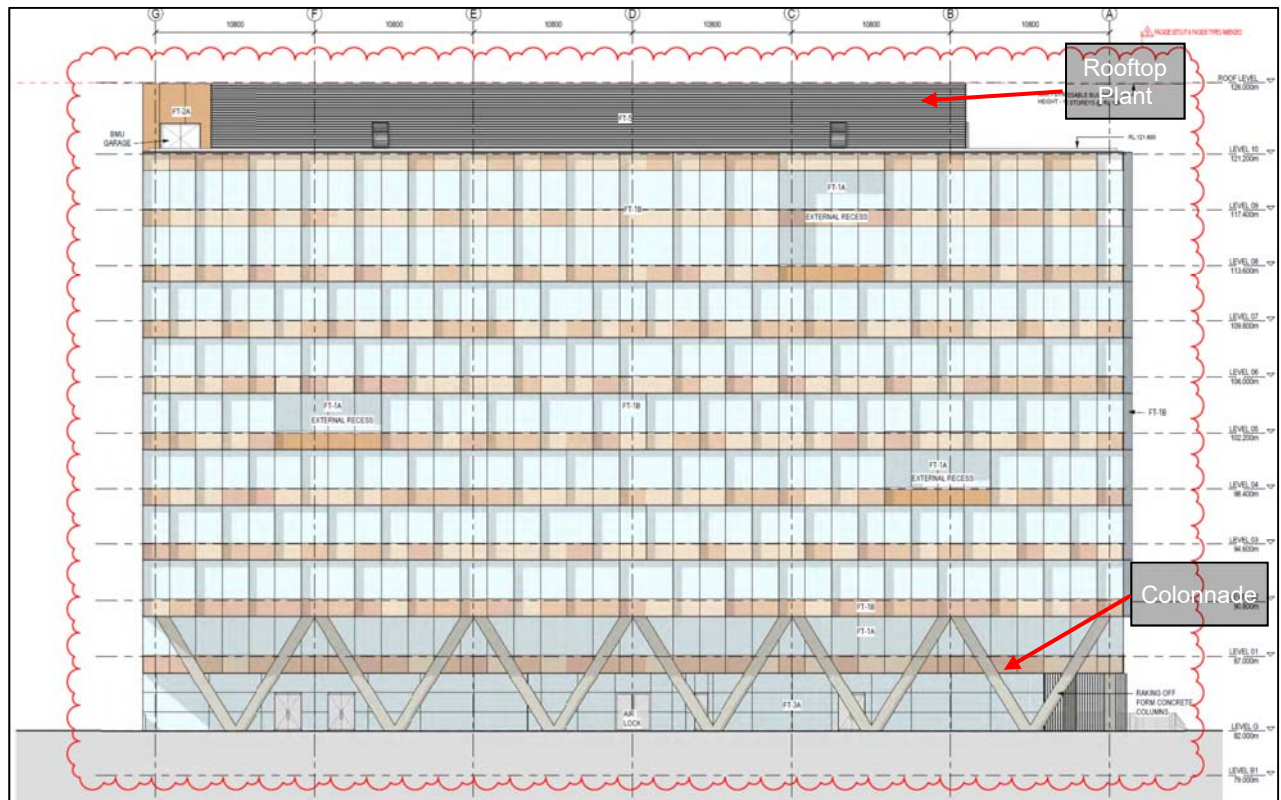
Northern Elevation (source: RtS – BVN Architects)
